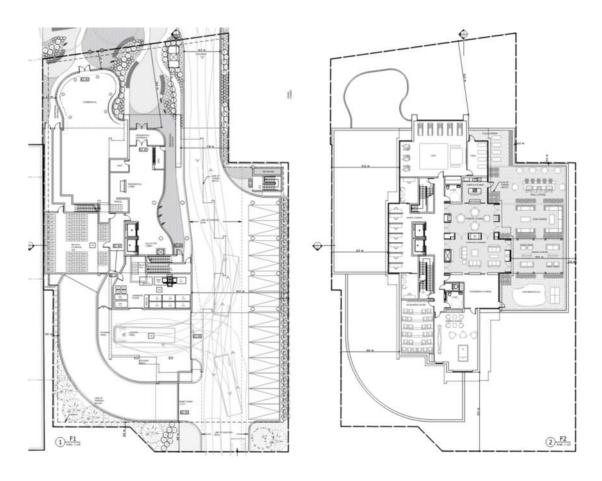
Proposed Site Plan and Second Floor Plan (Tregebov Cogan Architects)
